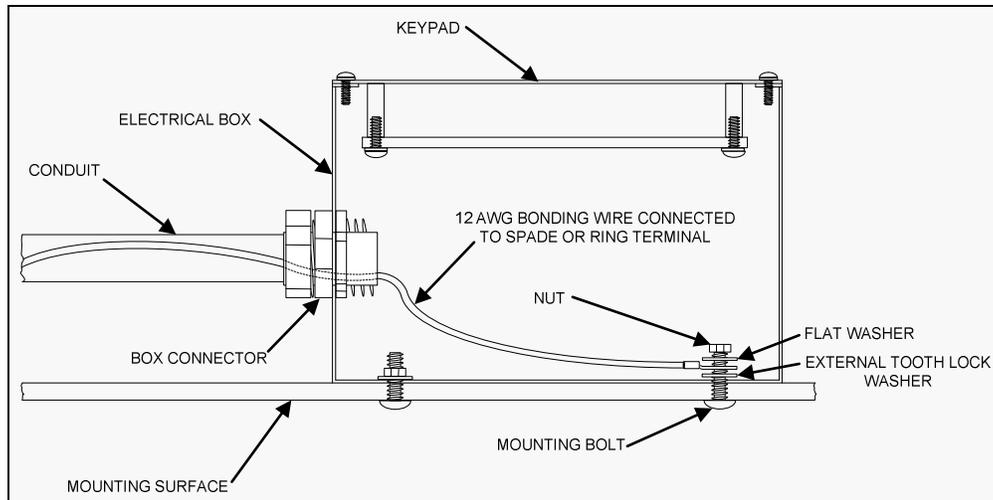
Keypad 314 Rubber/Metal Wire Bonding Example 1
